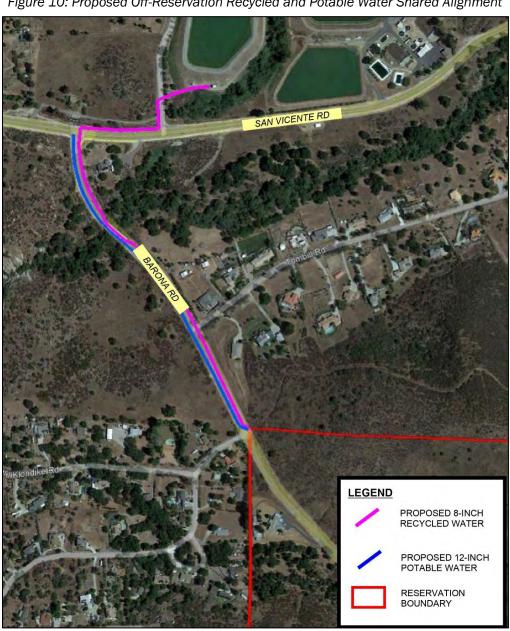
Proposed Off-Reservation Recycled and Potable Water Shared Alignment
